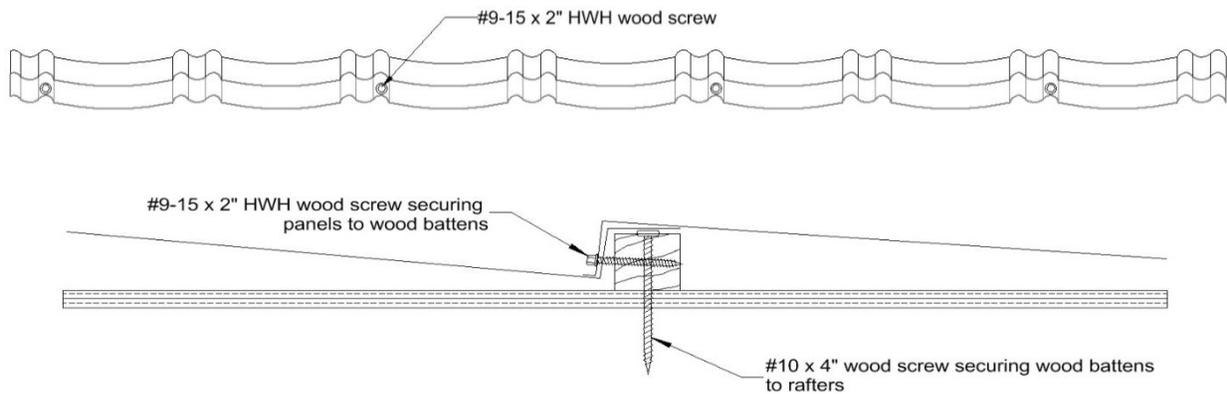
Terrabella Classic® Panels Fastened to Wood Battens
